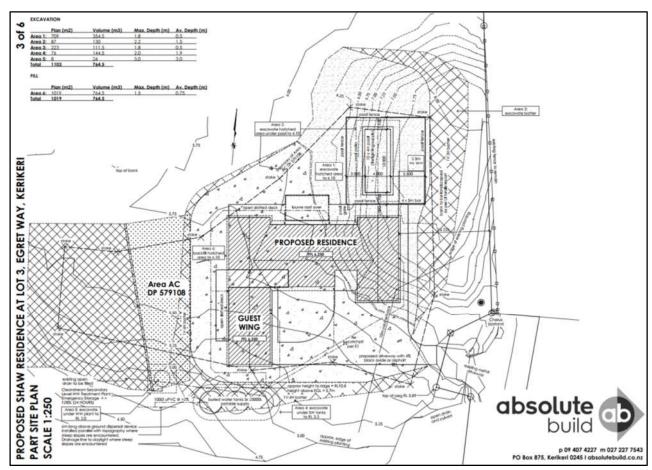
Site plan showing the location of the proposed dwelling. North up the page.
